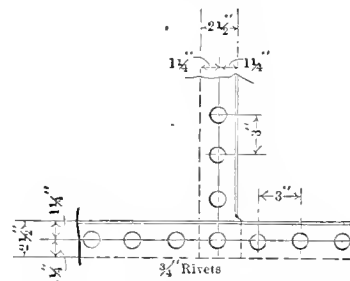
DETAIL OF RIVETING OF TOP RINGS.
